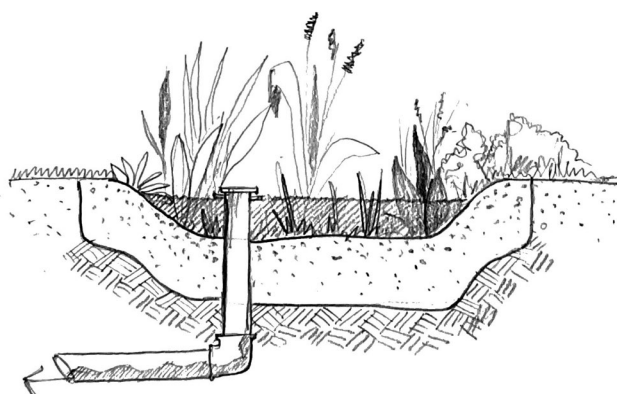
(Above) Section of a typical swale with overflow into the drainage system
